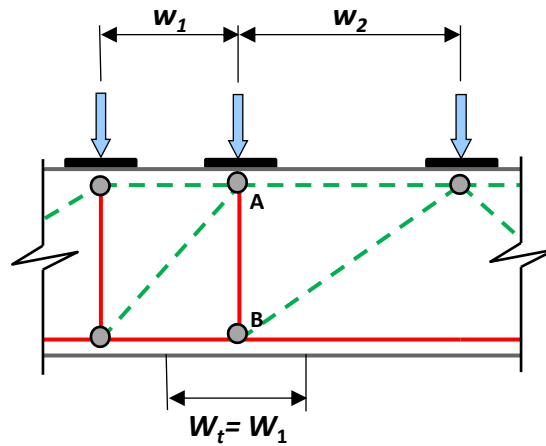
Width of Tie for Determining Required Stirrup Spacing
